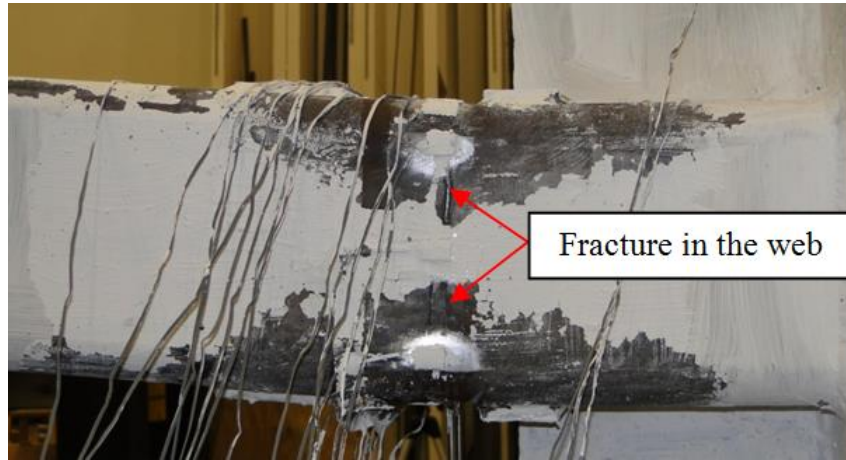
Specimen 2HSS8-2 at the End of the Test
